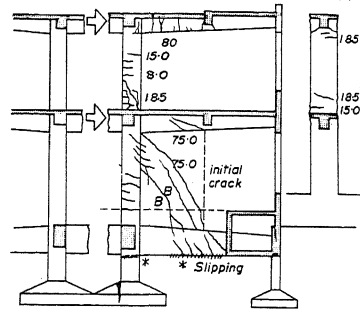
CRACK IN HAMAMATSU SHEAR WALL
